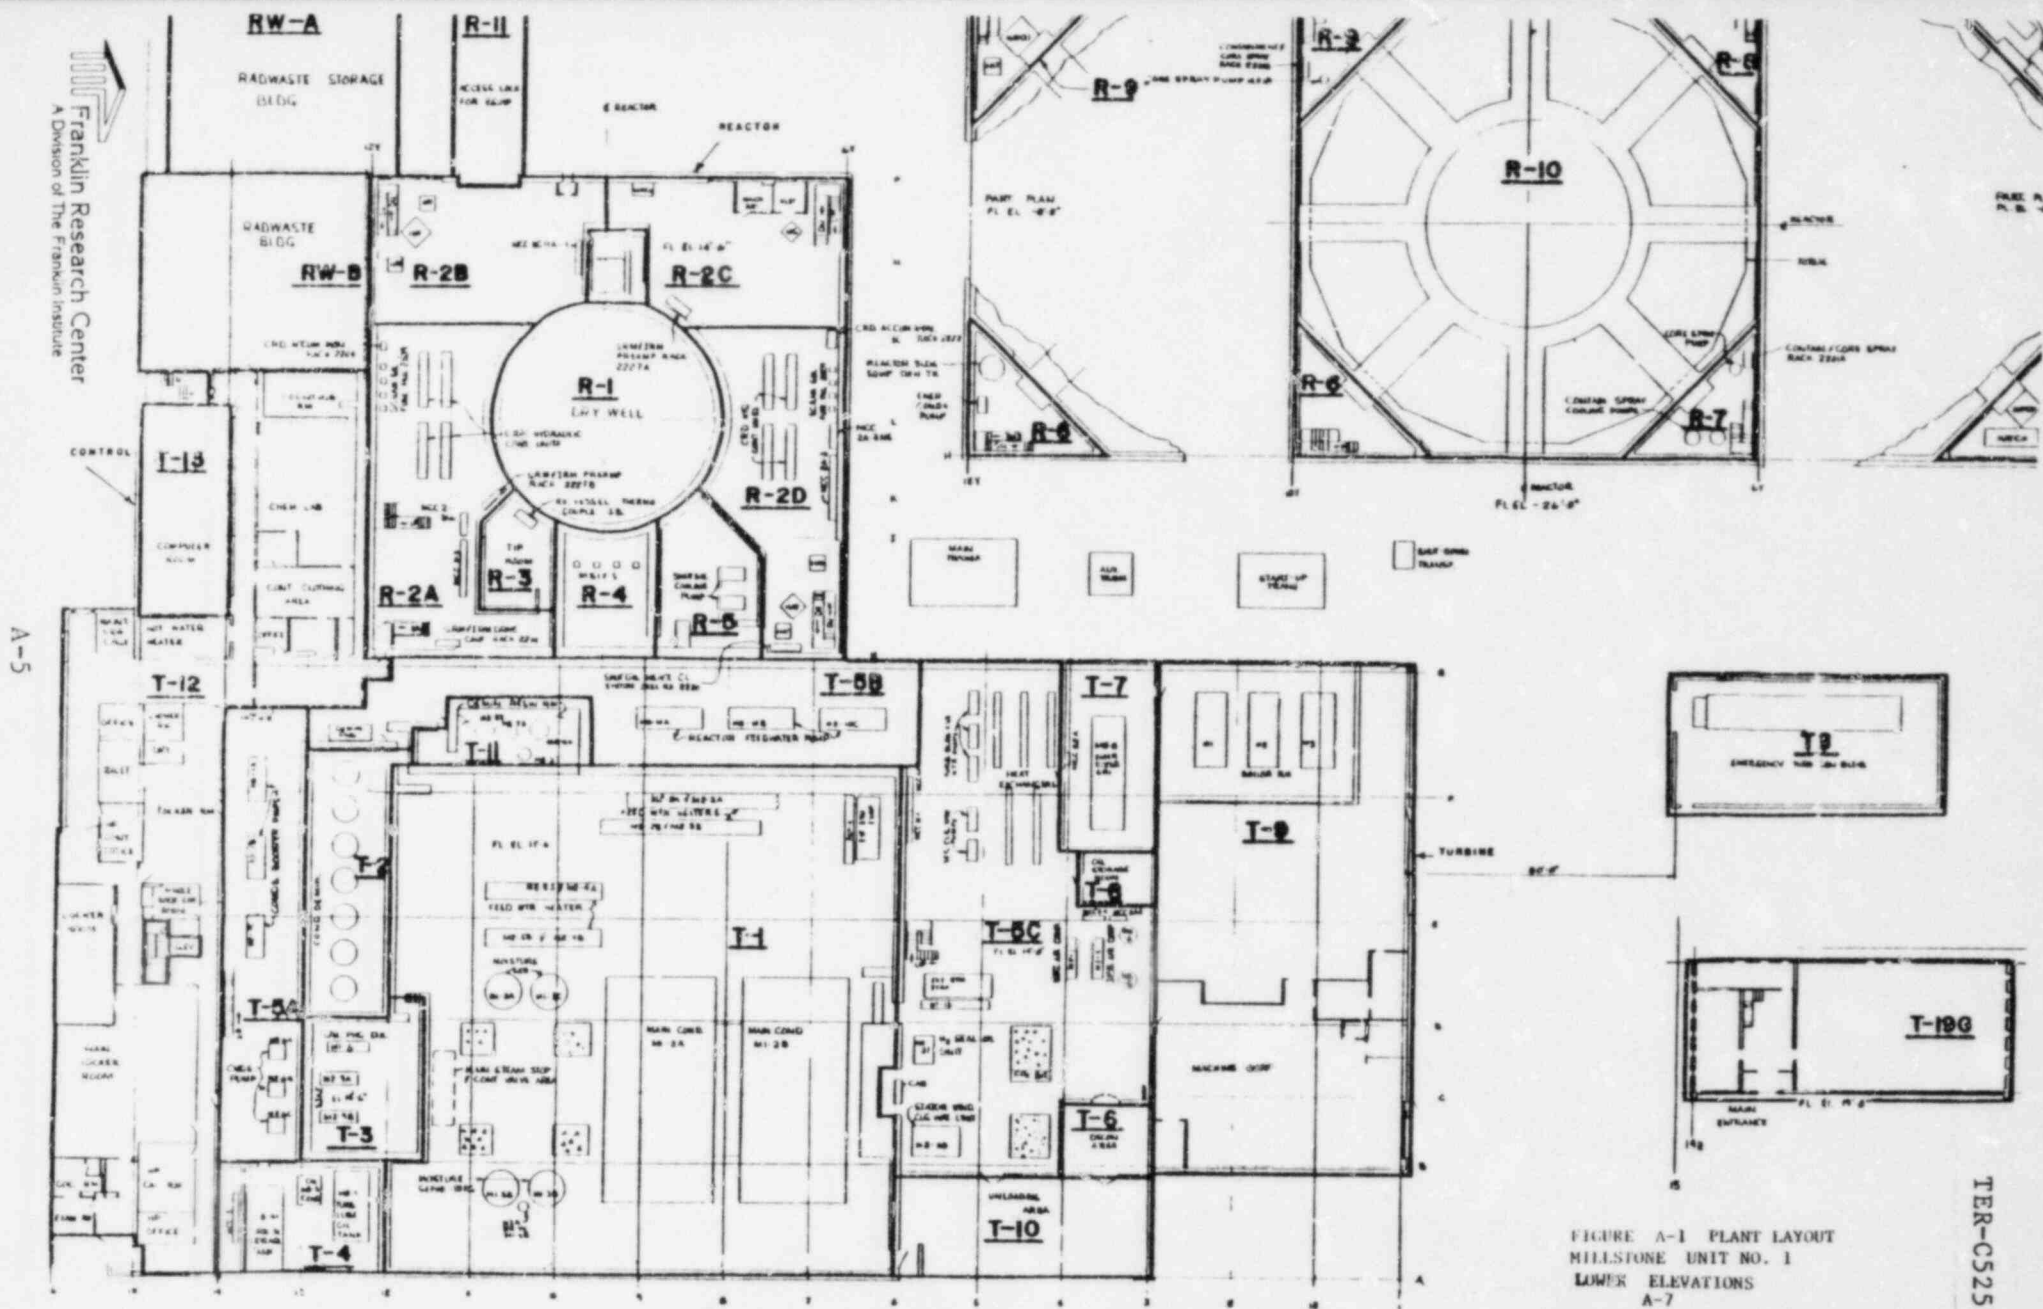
Millstone Point Unit 1 Plant Layout, Lower Elevations [8]
